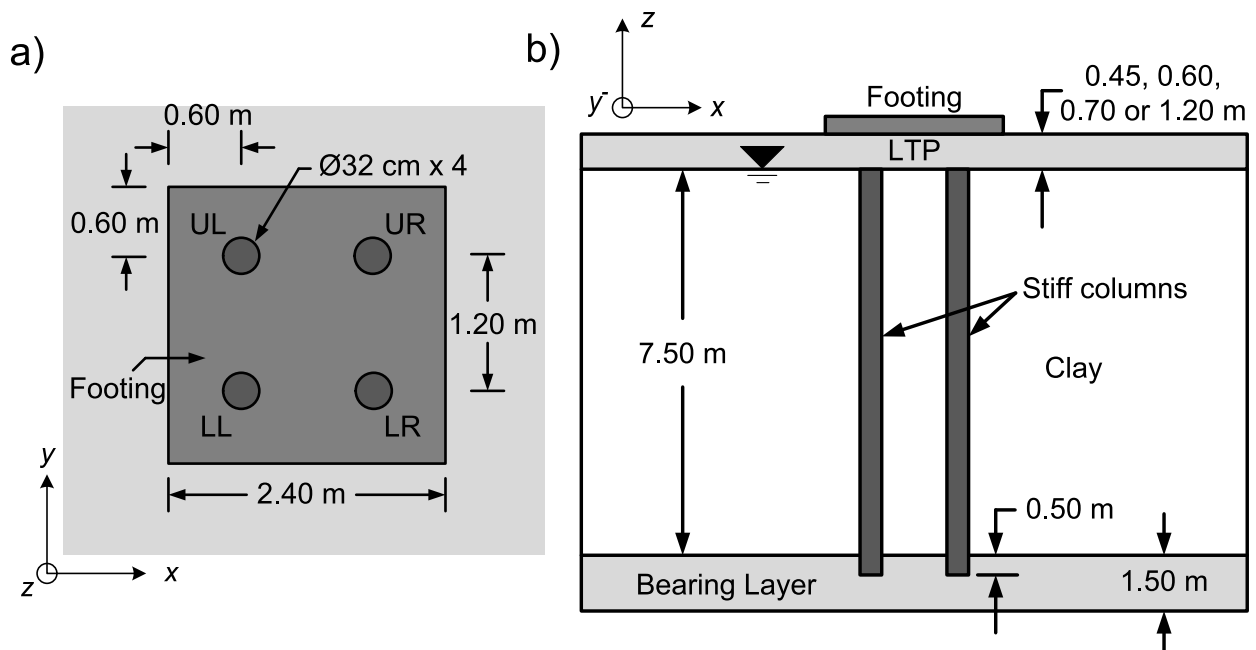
Geometry examined in the numerical study, a) plan view above shallow foundation and b) cross-section. Not to scale.
